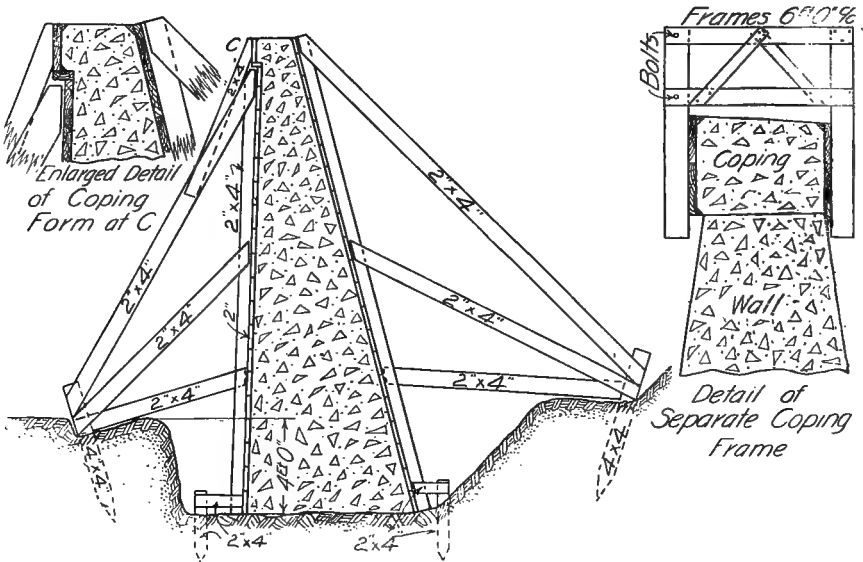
FORMS FOR GRAVITY RETAINING WALL
